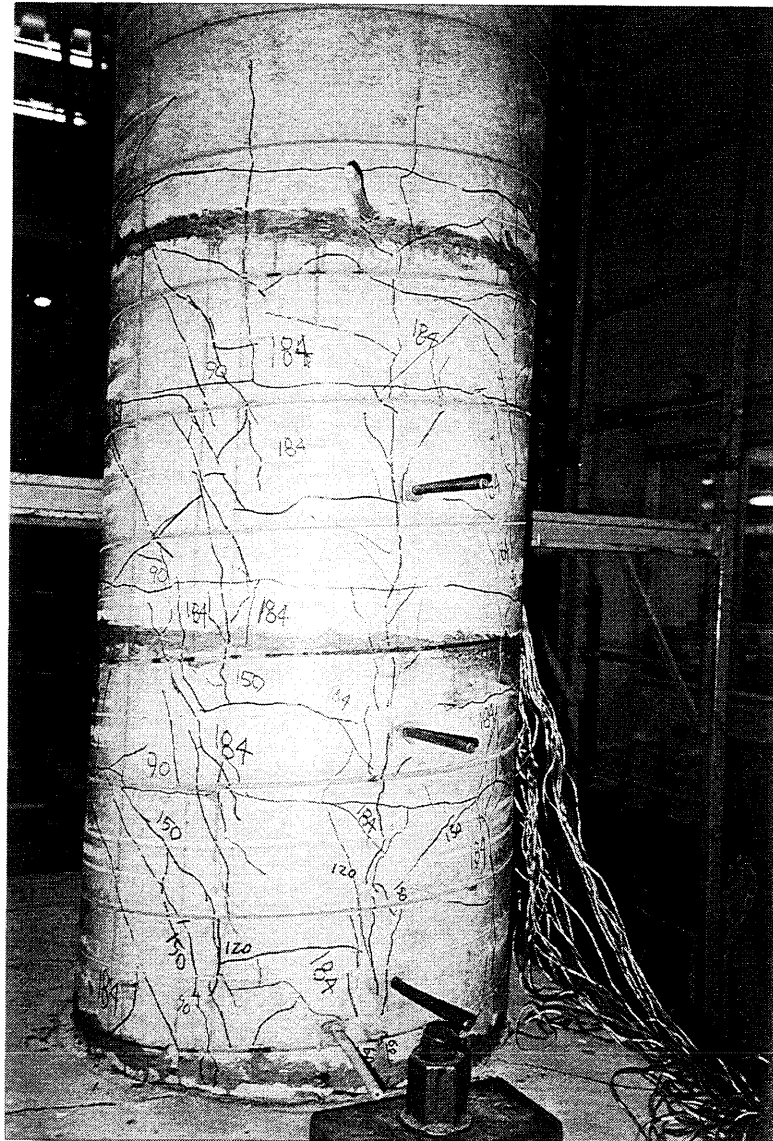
Cracks on Tension Face for Negative Loading
